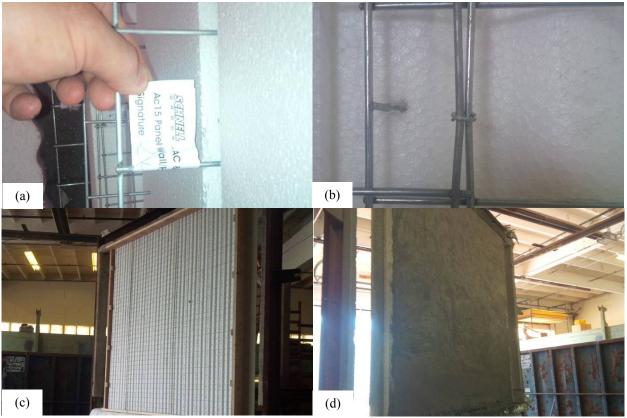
Assembly construction showing (a) identification, (b) mesh overlap and crimp,(c) installed foam, and (d) complete assembly.
